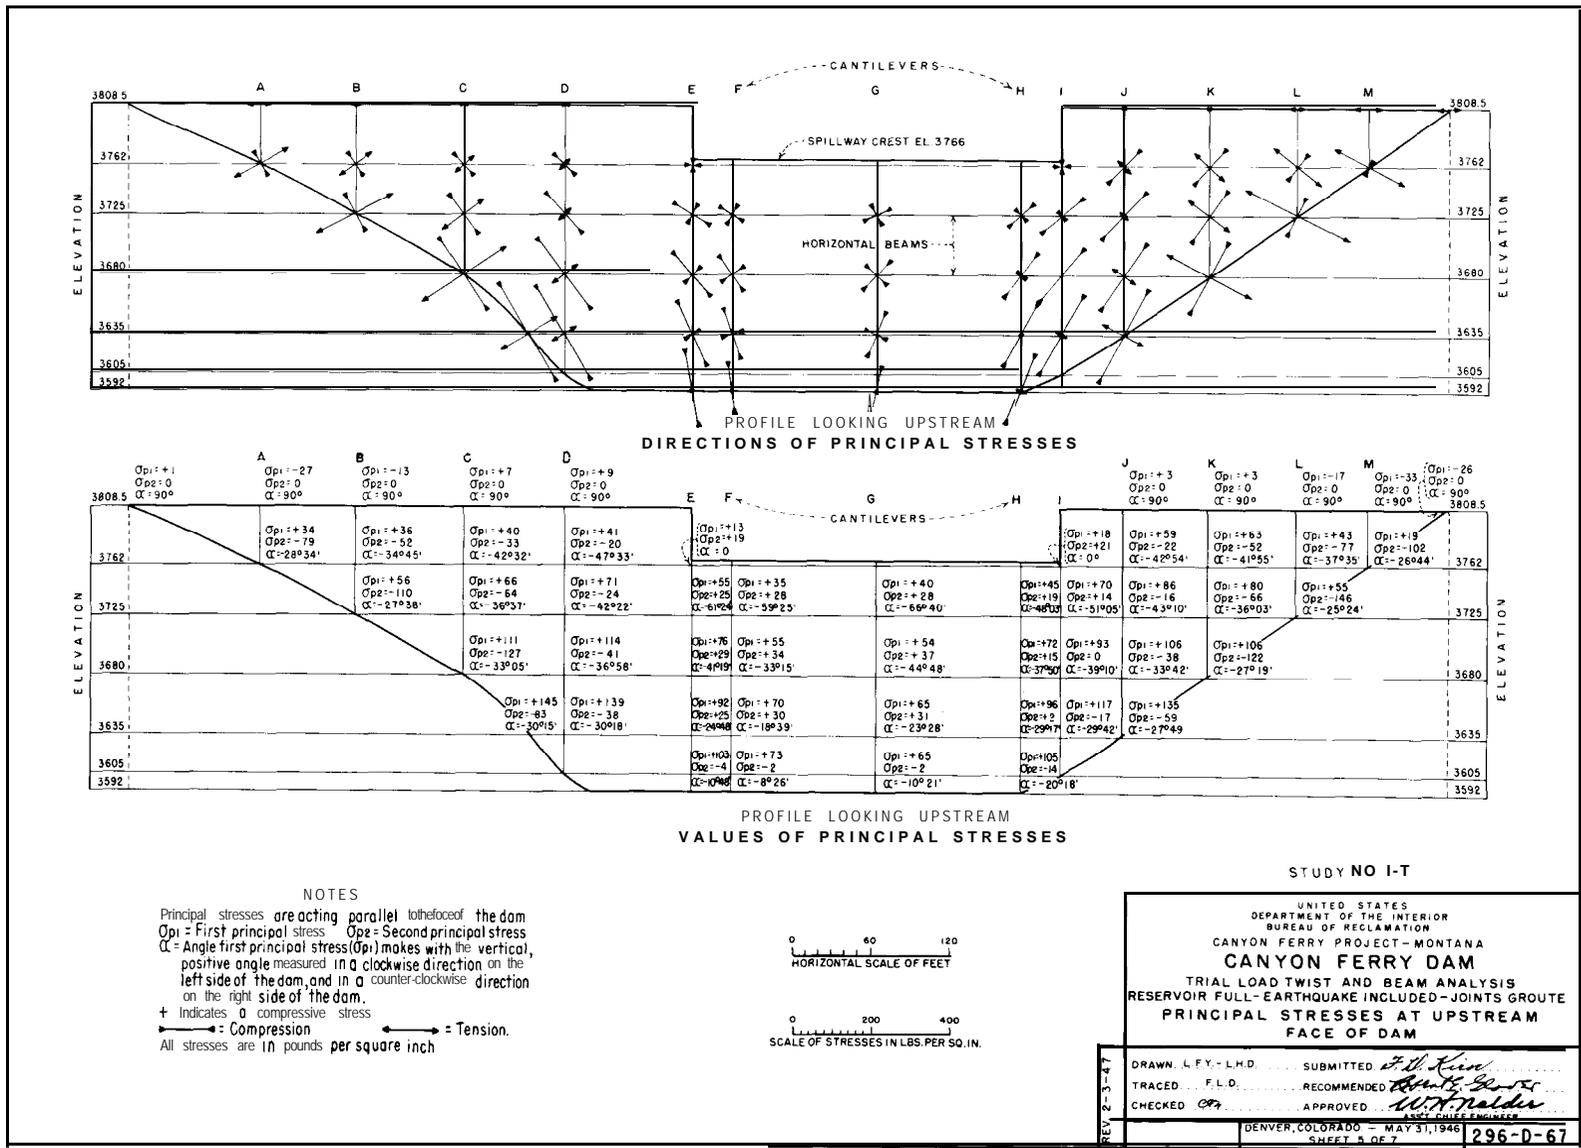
Canyon Ferry Dam study-principal stresses at upstream face of dam.
